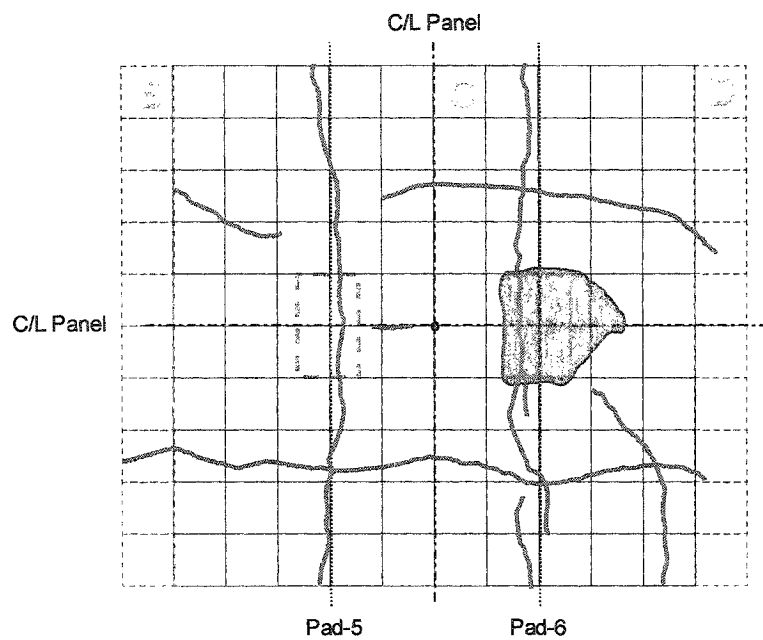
Panel-C: Crack Patterns on Top after Failure
